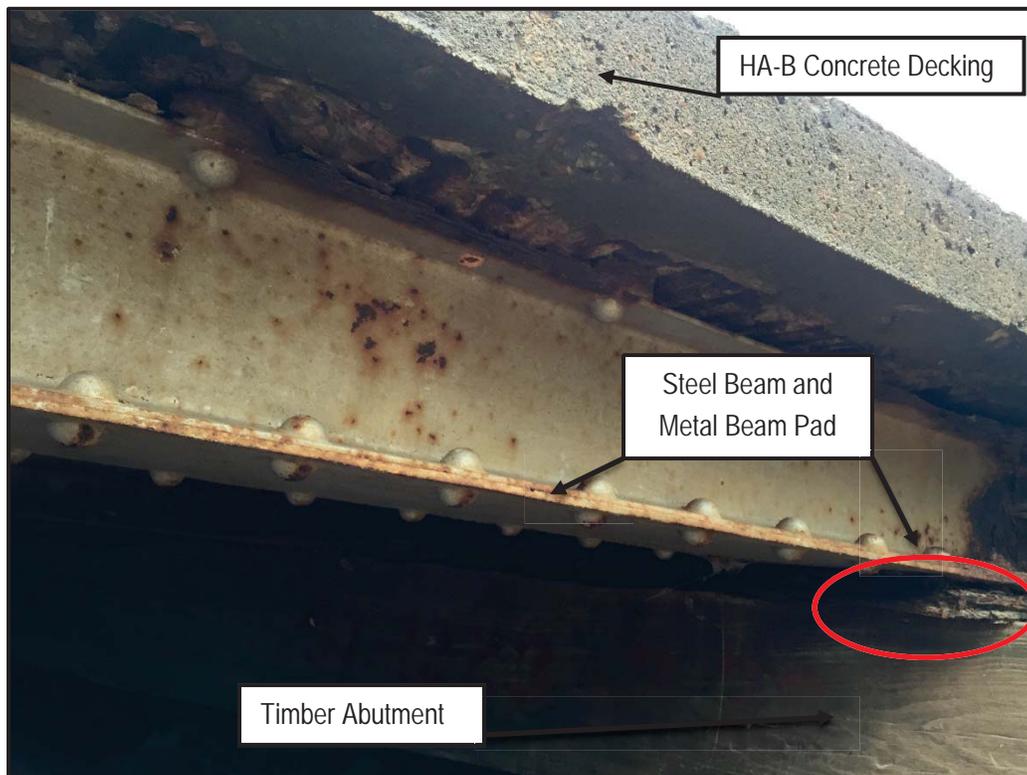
View of HA-B over timber abutments, steel beams, and metal beam pads
